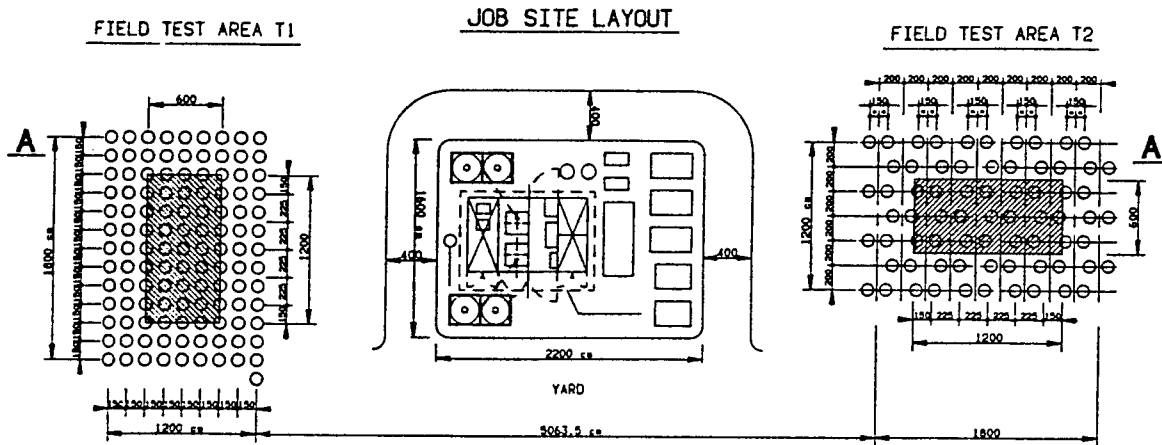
Layout of pile test areas (Pavianni and Pagotto, 1991).
